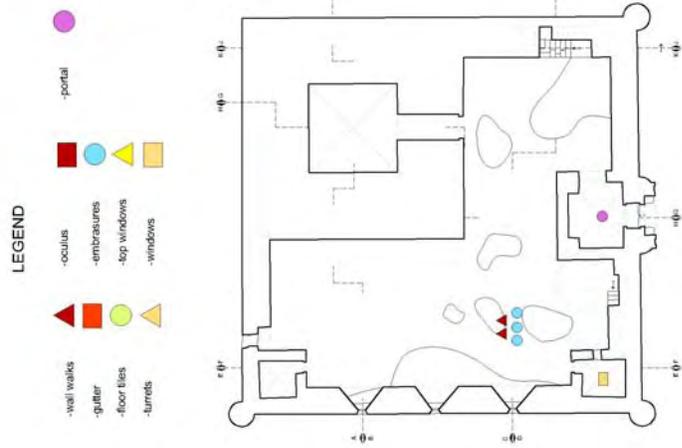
Wealth of Architectural Elements in the Spaces- Floor Plans.
